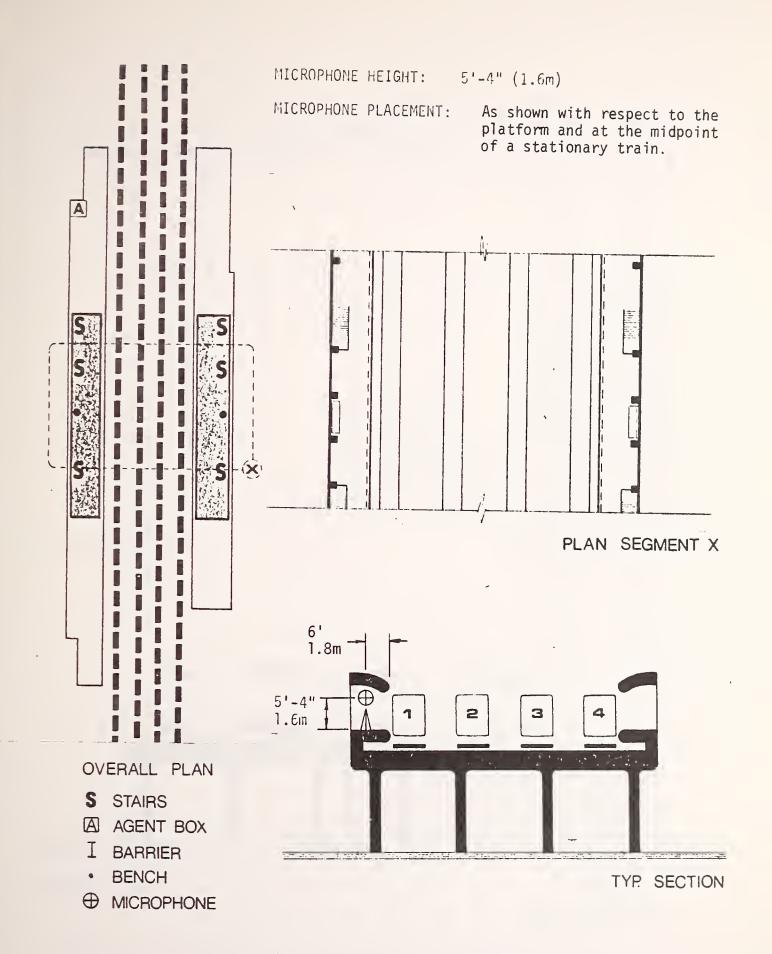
Side Platform Elevated Steel Station Configuration (Station Type 2)
